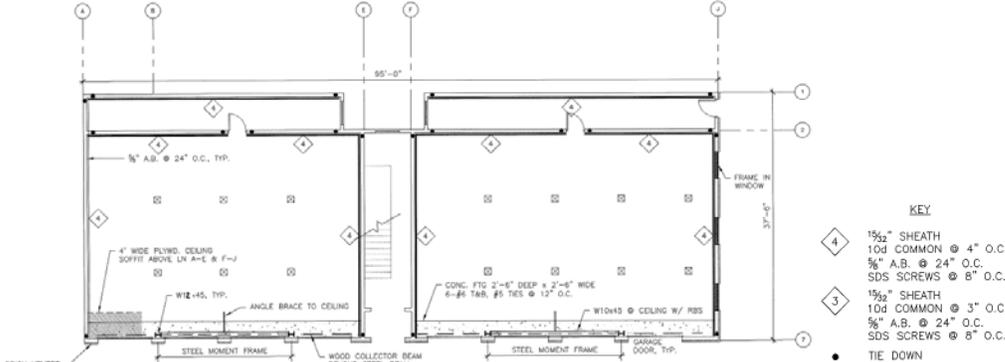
Index Building 1, ground story Retrofit 2 plan. Retrofit is limited to the ground story.
